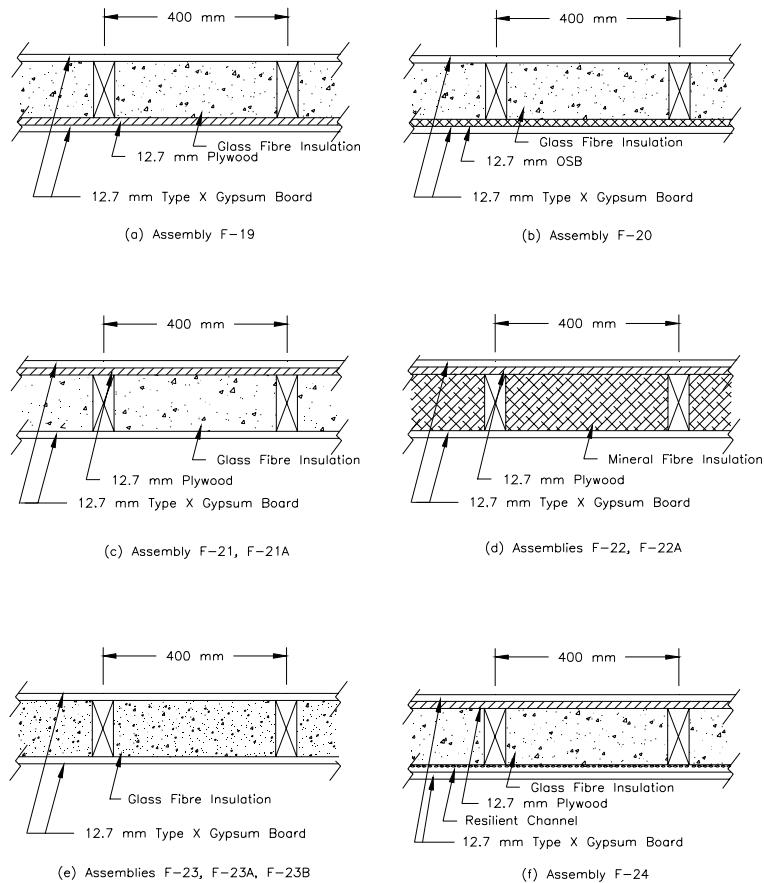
Cross-Sectional Details of Wood Stud Wall Assemblies
